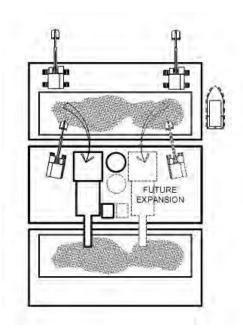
General Layout of the Pre-Mixing Plant On-Barge (Case 2 and 3)
